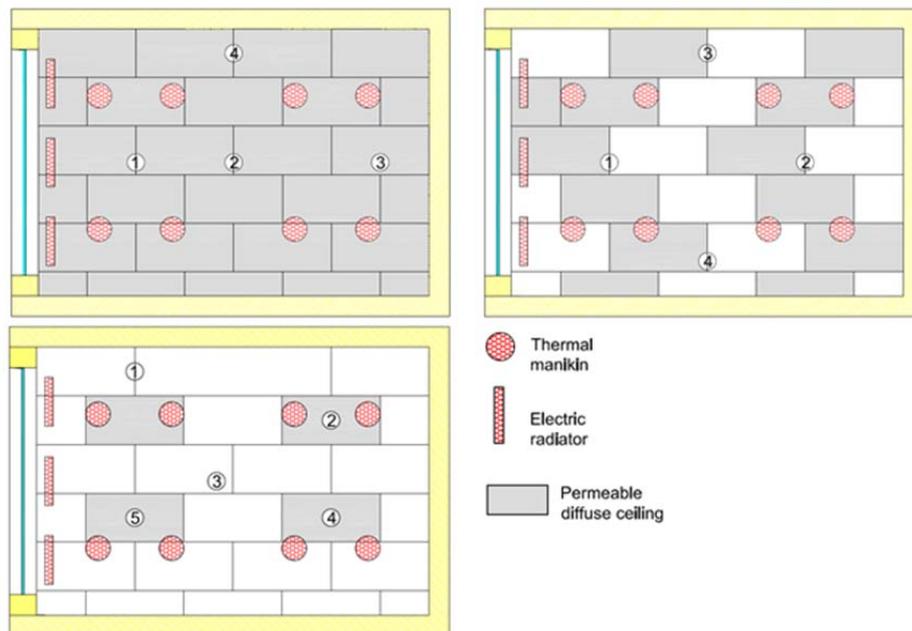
The layout of diffuse ceiling with different opening areas [2]
